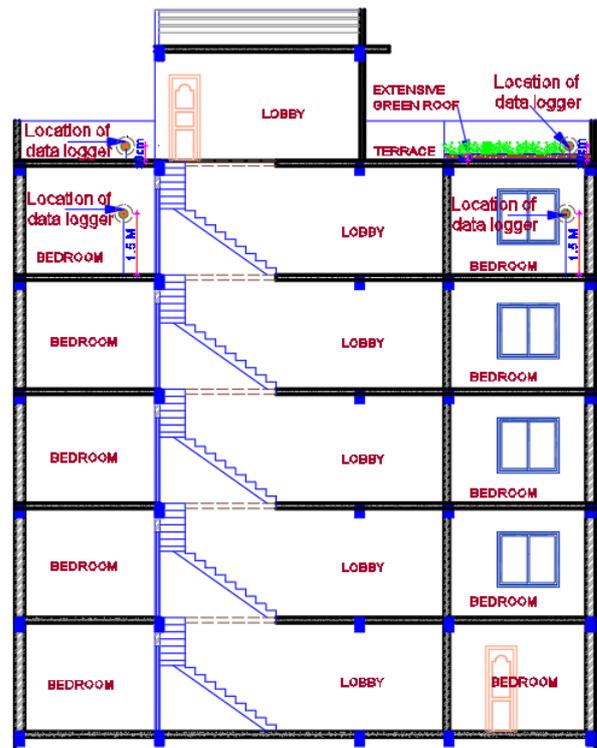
Building section of case 2 building with locations of data logger in indoor and outdoor of building for air temperature measurement.
